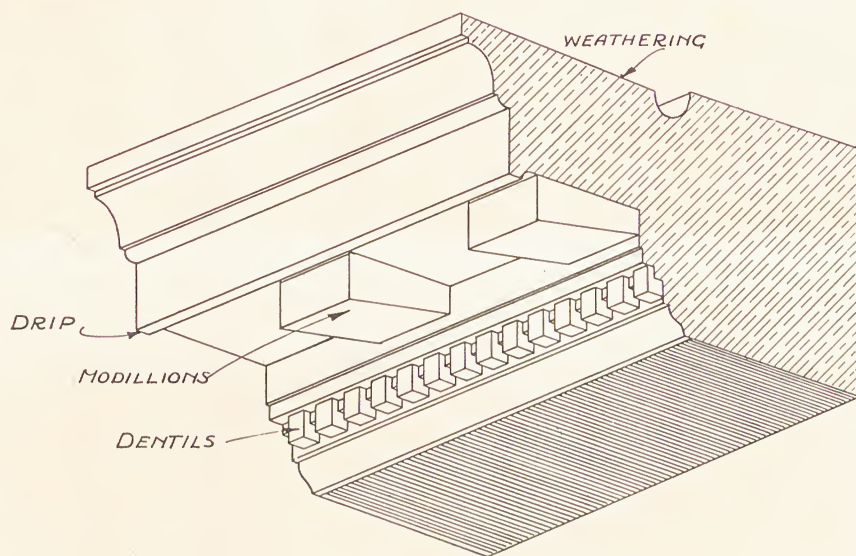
DETAIL OF A PIECE OF CORNICE IN ONE BED.
